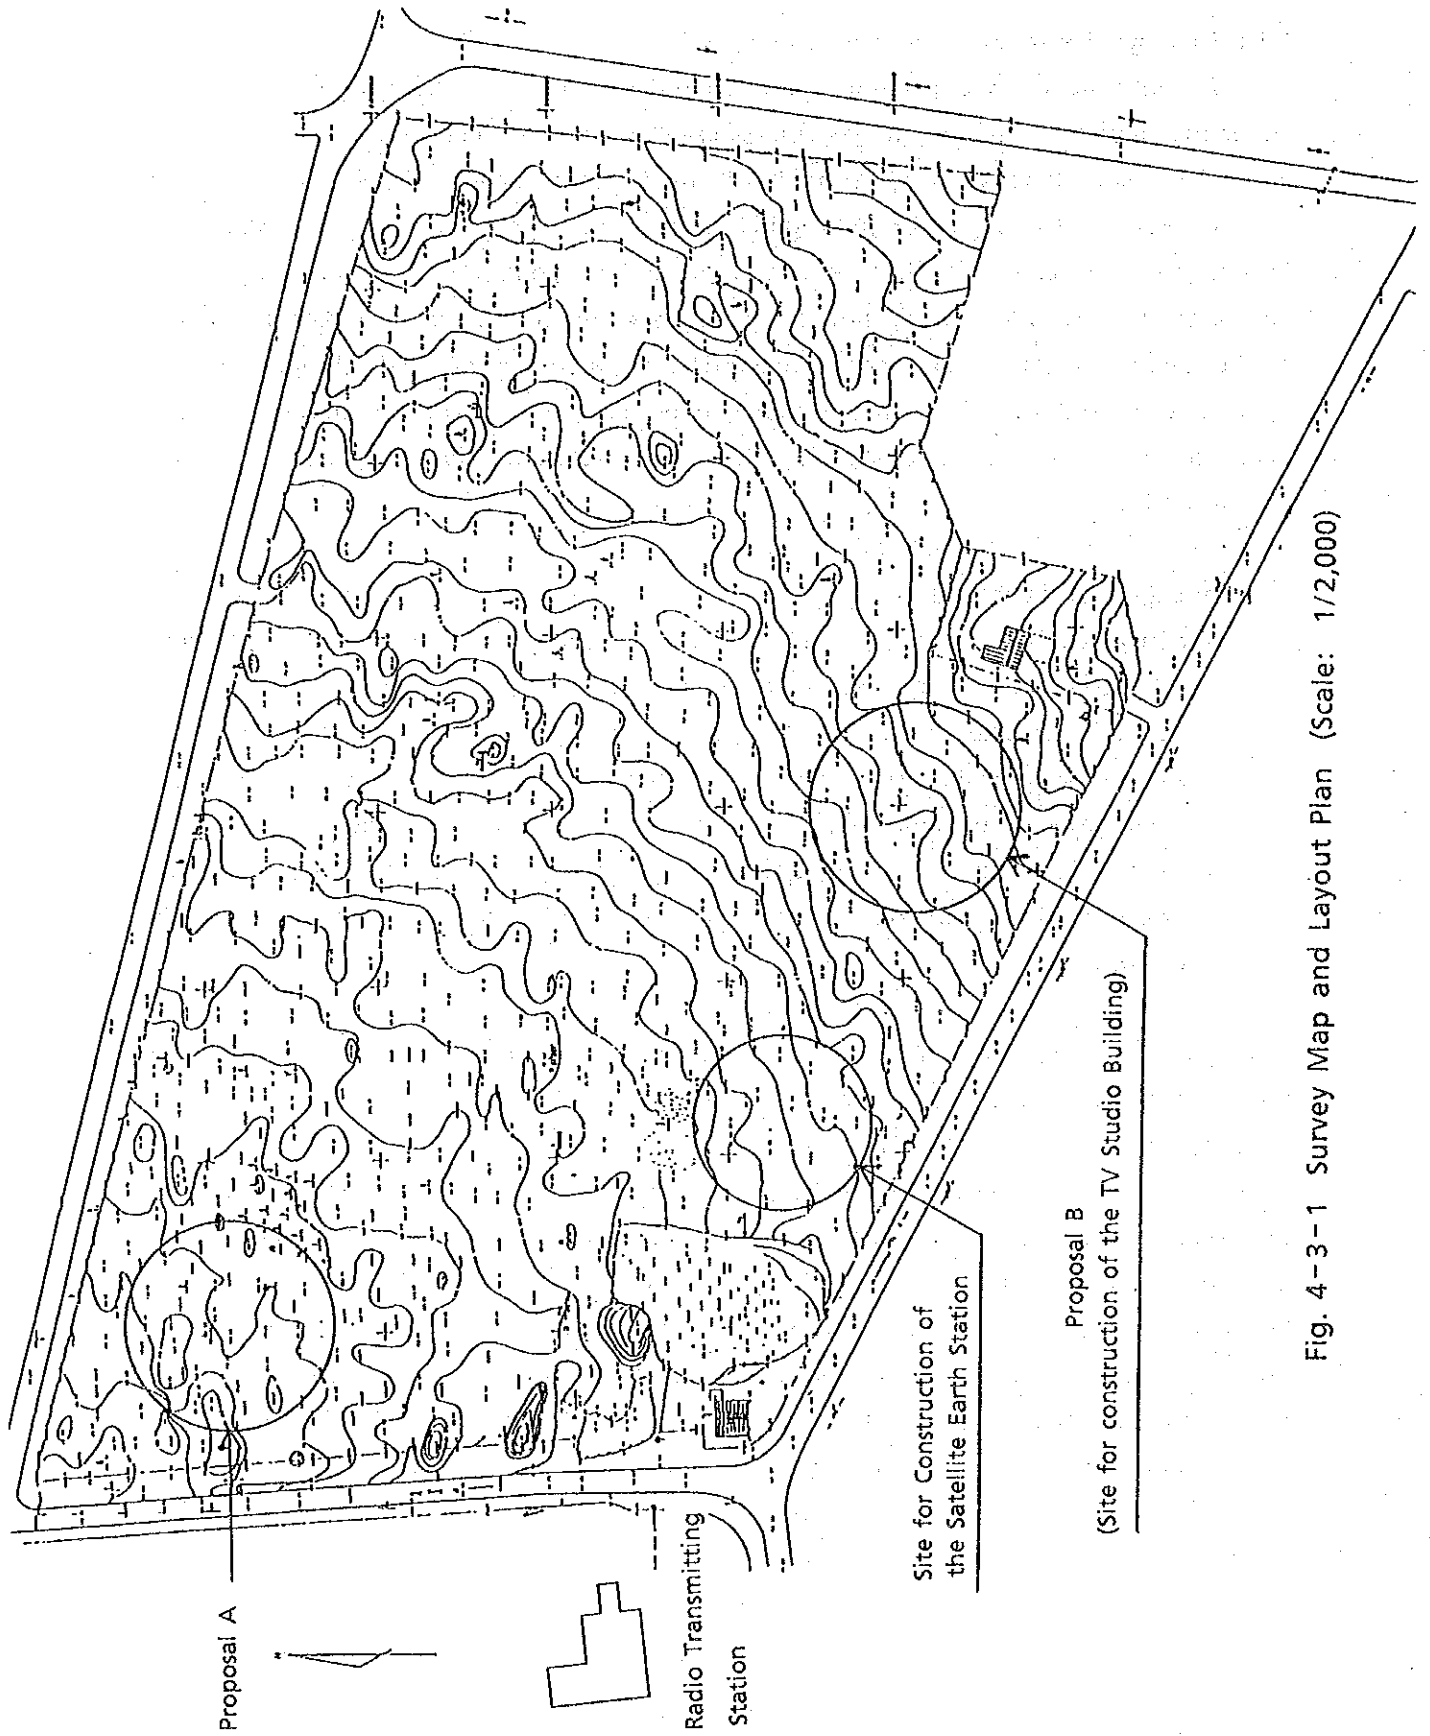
Survey Map and Layout Plan (Scale: 1/2,000)
